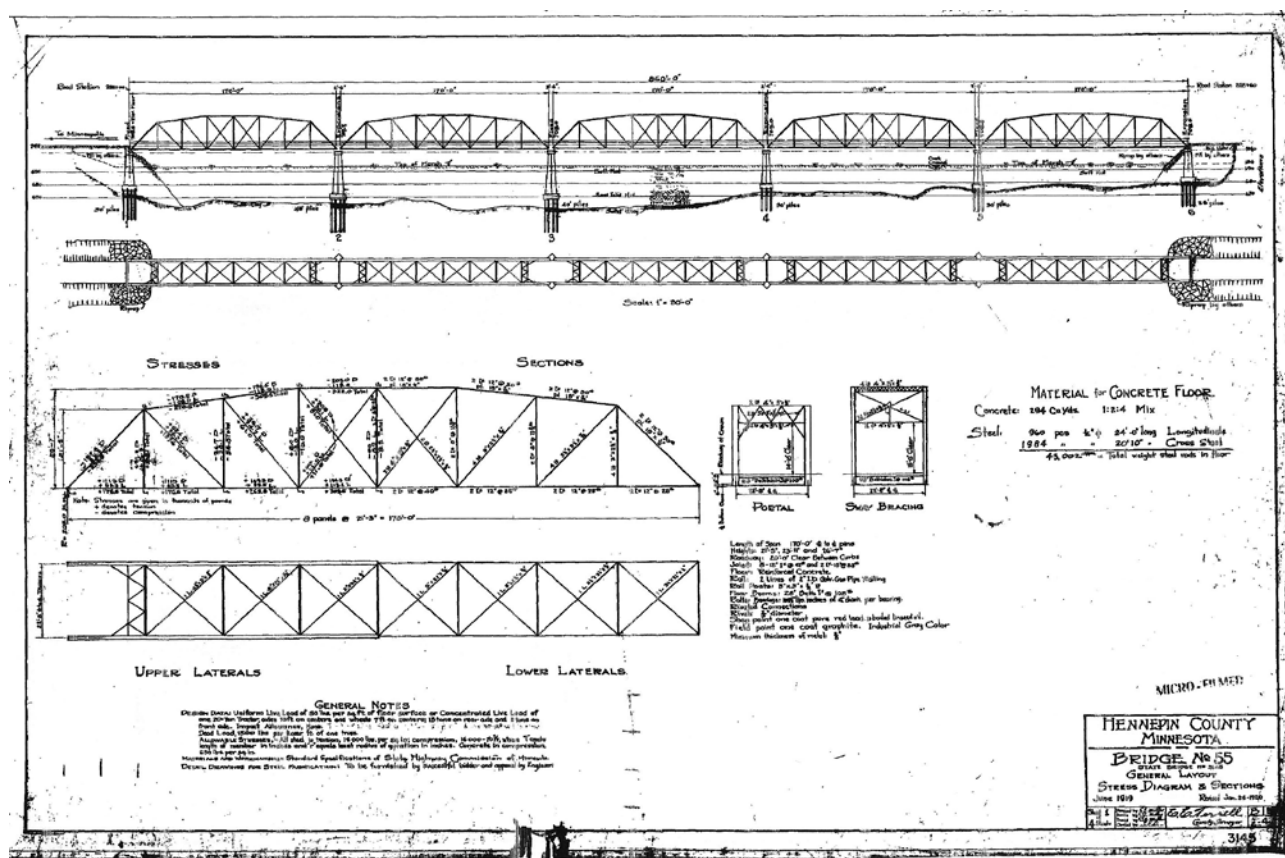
Long Meadow Bridge, General Layout View. 1919 Plan Set. Source: Minnesota Department of Transportation.
